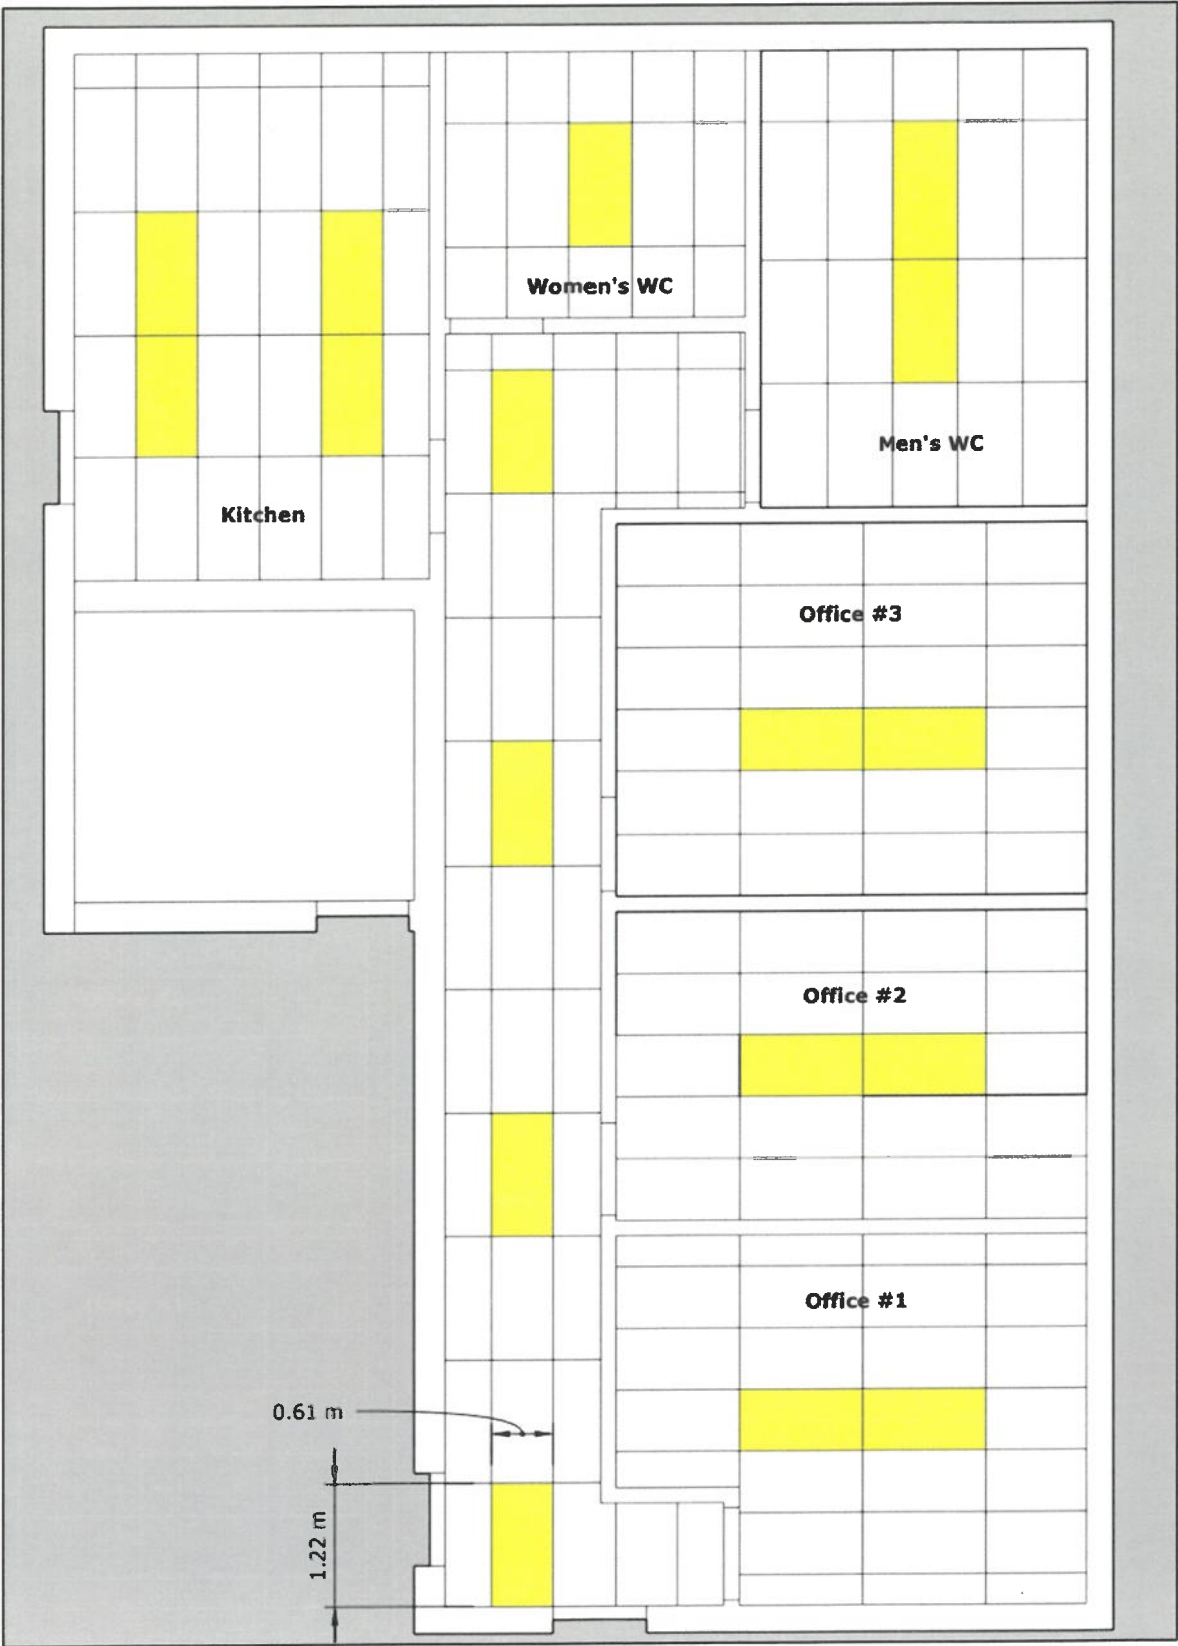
Reflected Ceiling Floorplan of Building 502 showing the locations of the fluorescent lighting fixtures in the drop-ceiling.
